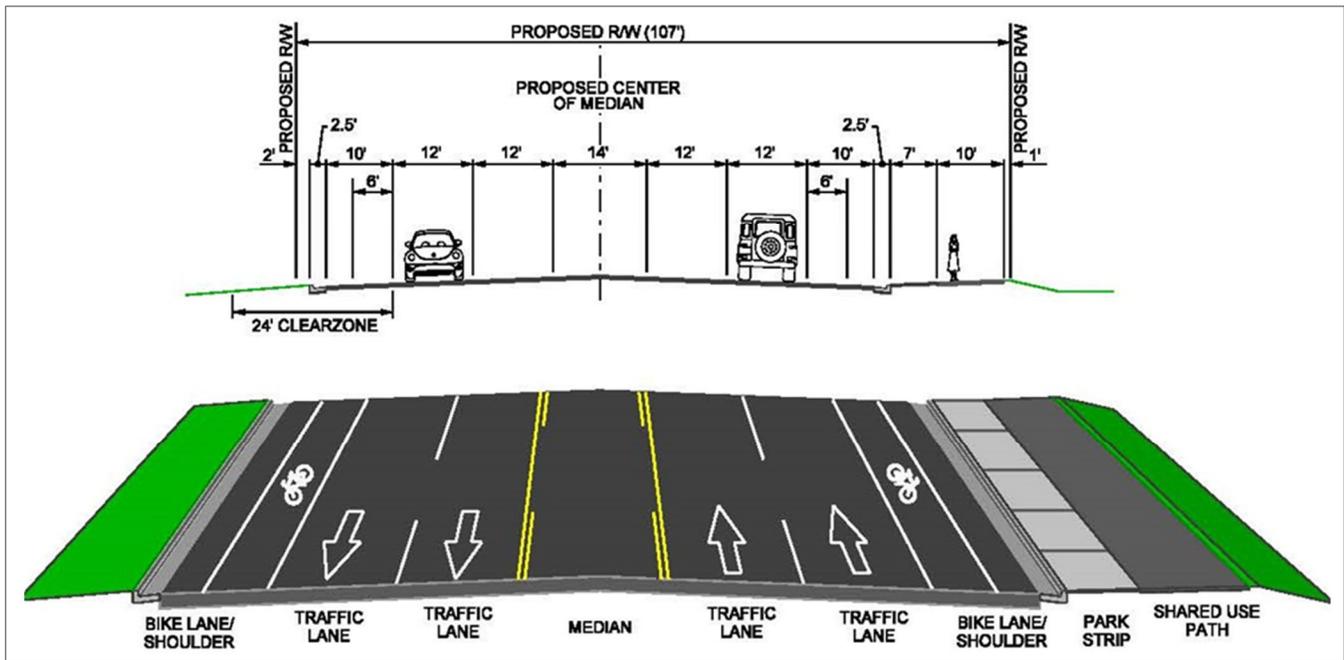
Wasatch Boulevard Sub-alternatives – Imbalanced-lane Alternative Cross Section
